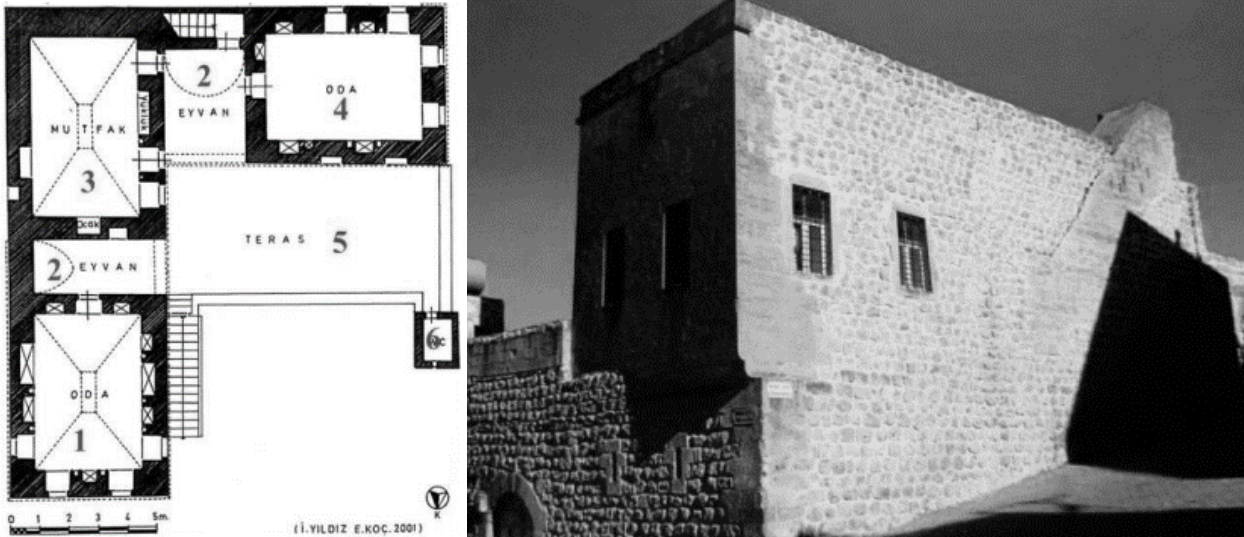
Enver Aras House 1<sup>st</sup> Floor Plan(left), Photo(right) (Yıldız, 2011)
